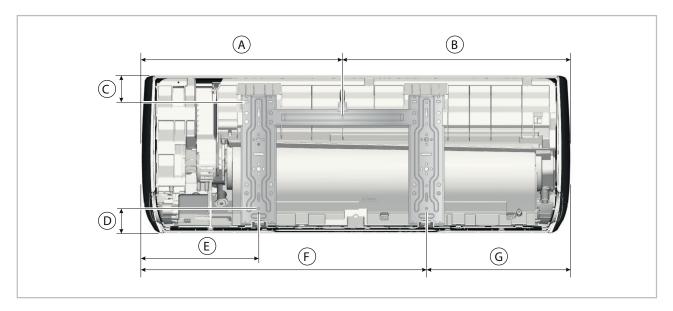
Mounting points for the wall bracket BL 264-354 DC IT (rear view, all dimensions in mm)
